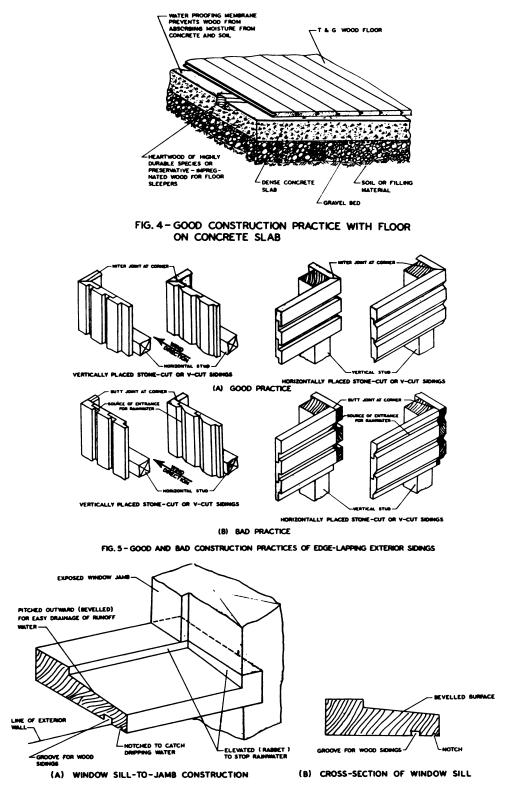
RECOMMENDED SECTION DETAIL FOR WINDOW SILL
